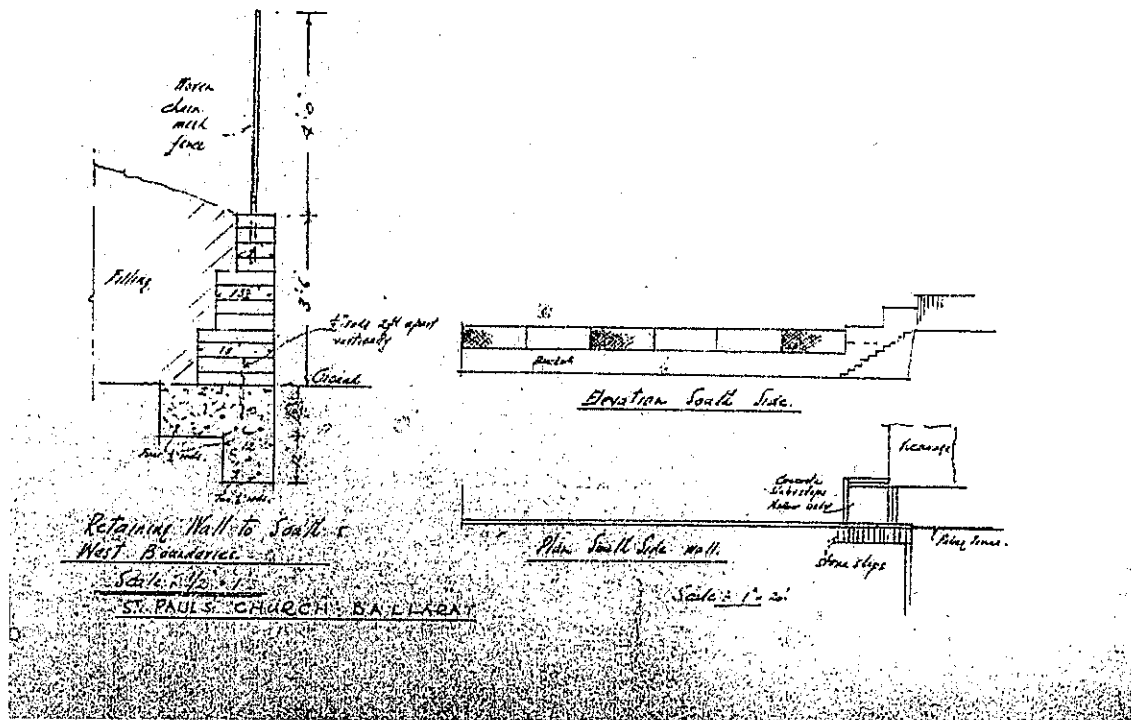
St. Paul's Church, Plan of Proposal Retaining Wall to the south and West Boundaries, August 1963. Source: St. Paul's Anglican Church.
